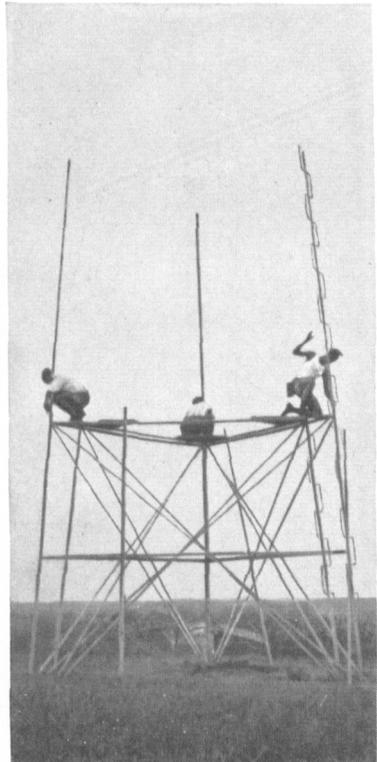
Lower section of tower completed, corner posts being bolted on for second section.
